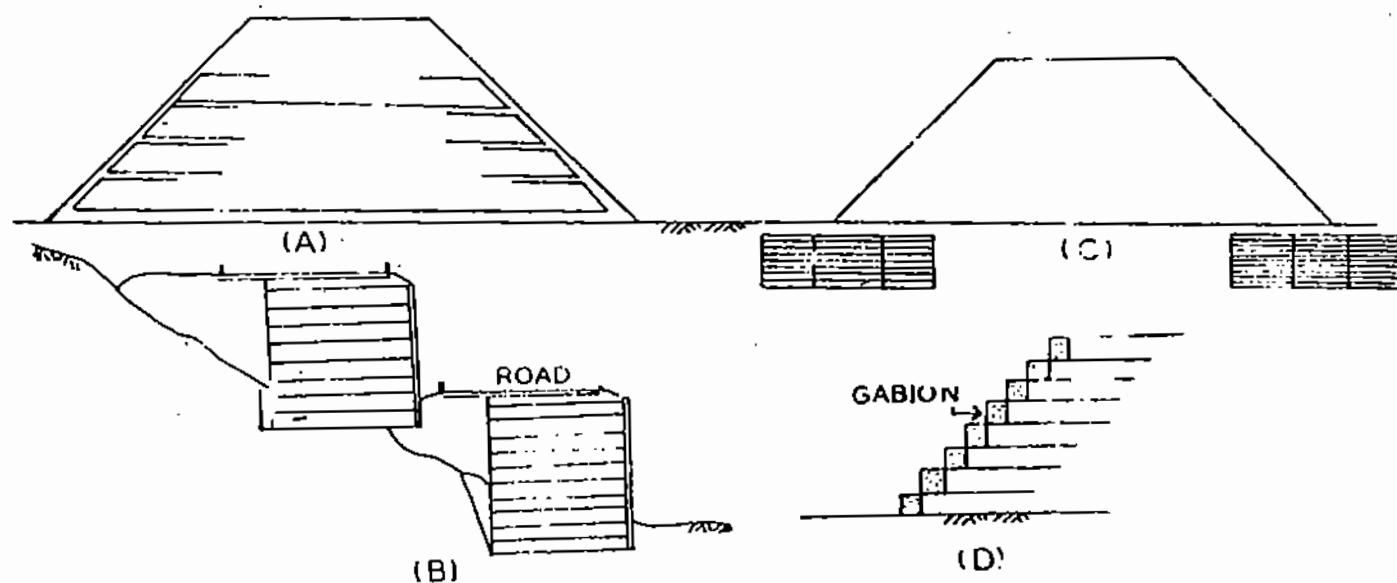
USE OF REINFORCED SOIL STRUCTURES IN ROAD WORKS IN (A) IMPROVING EMBANKMENT STABILITY (B) STEPPED UP ROADS (C) FOUNDATION IMPROVEMENT (D) GABION SUPPORT
